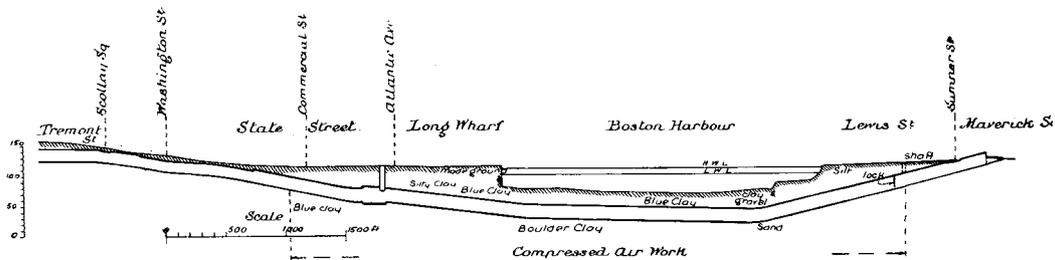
UNDERGROUND RAILWAY, BOSTON, U.S.A.
